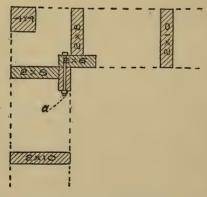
Cross section of studding at the corner of a rectangular silo. (Spillman.)
